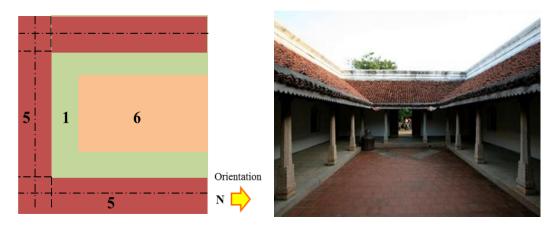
Merukanta (1 – Veranda, 5 – Main Building, 6 – Court) (Source: www.team-bhp.com)
